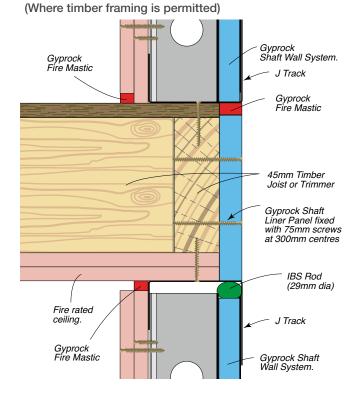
Junction of – /120/120 Shaftwall System to Timber Floor
